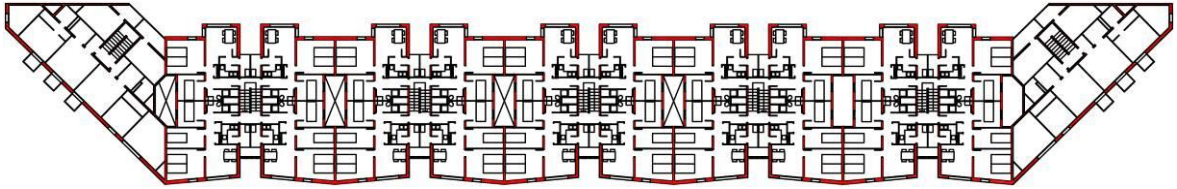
MBM. Housing building in carrer Pallars. Typical floor plan. Source: Redraw by M. Lucchini.
